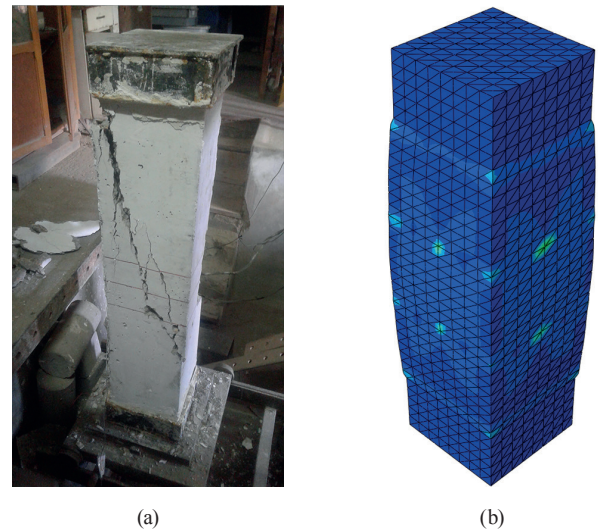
Modes of failure and crack survey for specimen CV-10.5: (a) experimental damage; (b) FE model plastic strain
